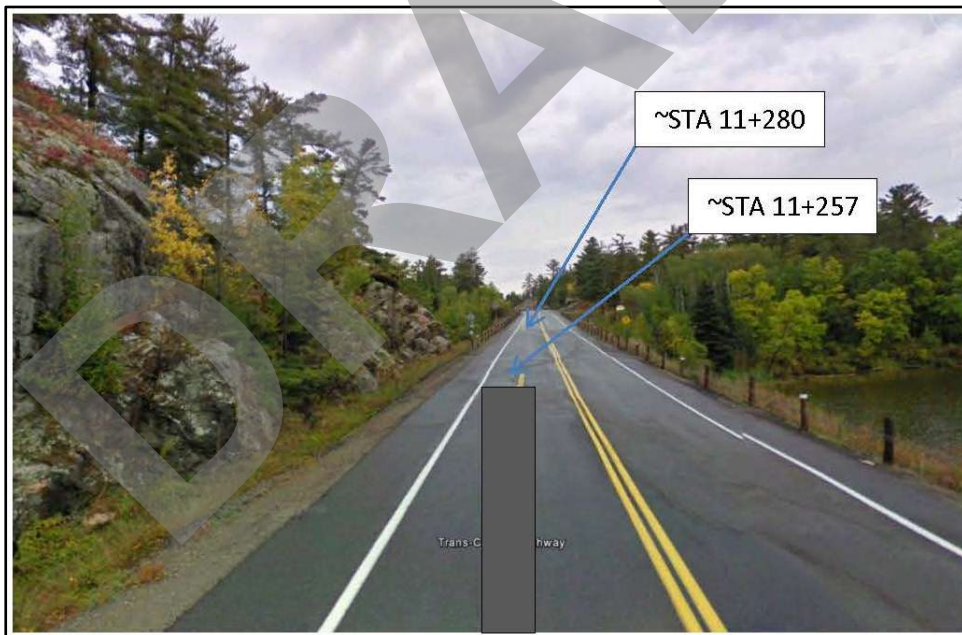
Embankment distress section looking north (courtesy of Google - 2009).
